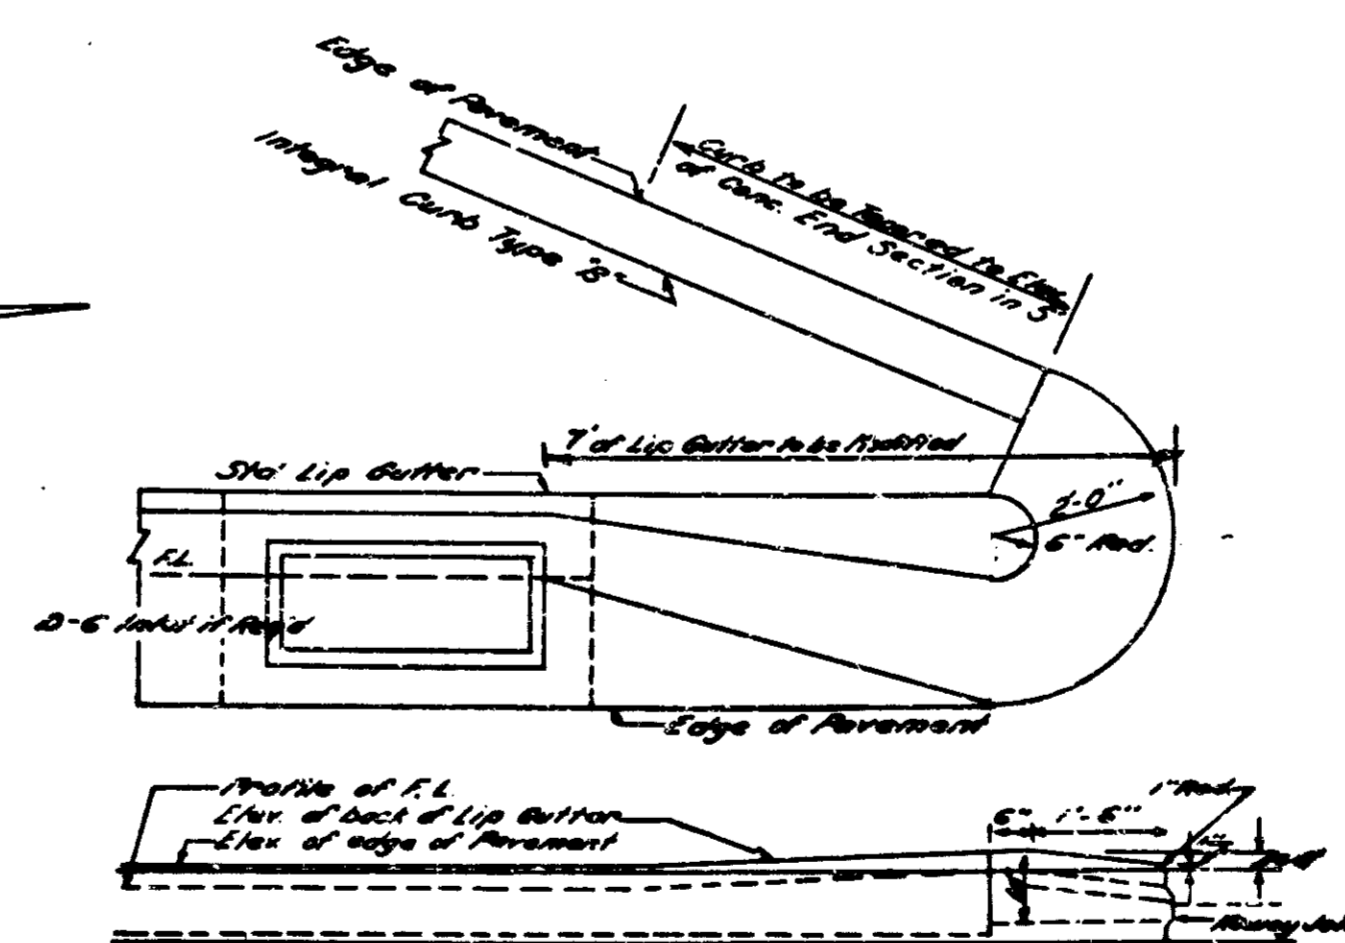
DETAIL OF ENTRANCE TO TYPE A₃ INLET
